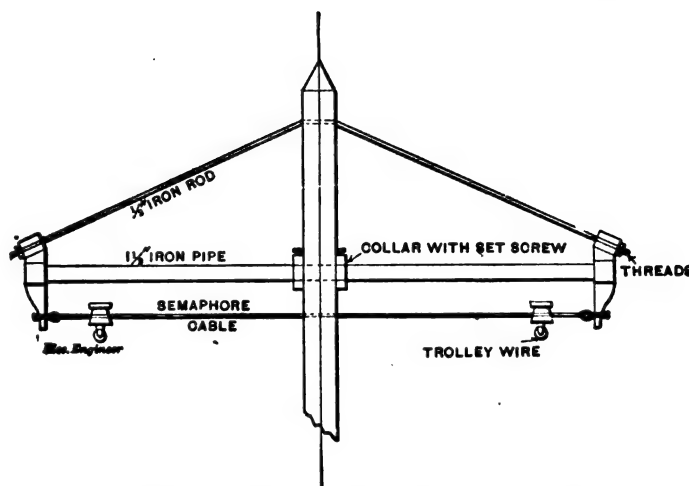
DOUBLE BRACKET CONSTRUCTION.
